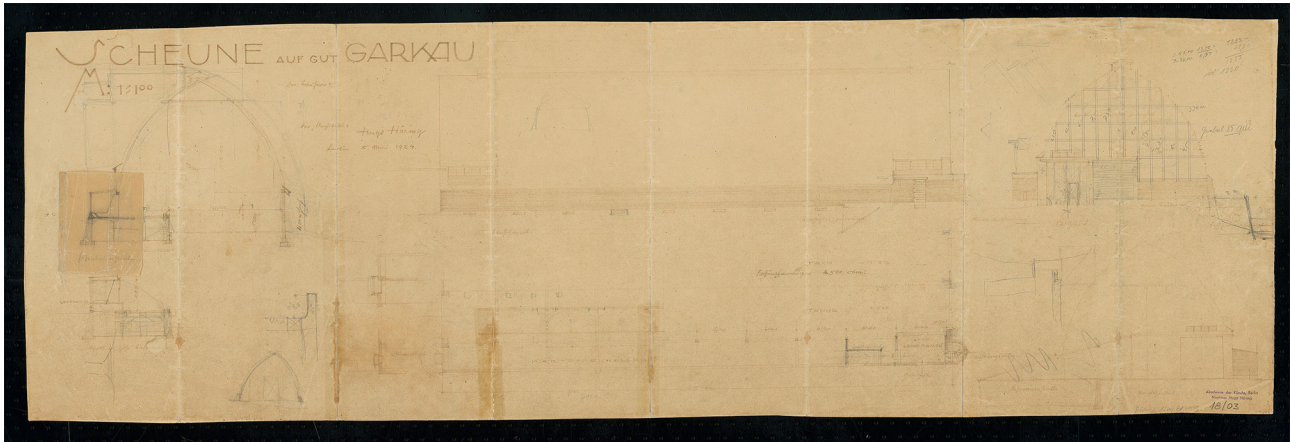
Ground floor, elevations and section, Häring-Hugo_1204_018_003-1024w, Akademie der Künste, Baunkunstarchiv, Berlin.
